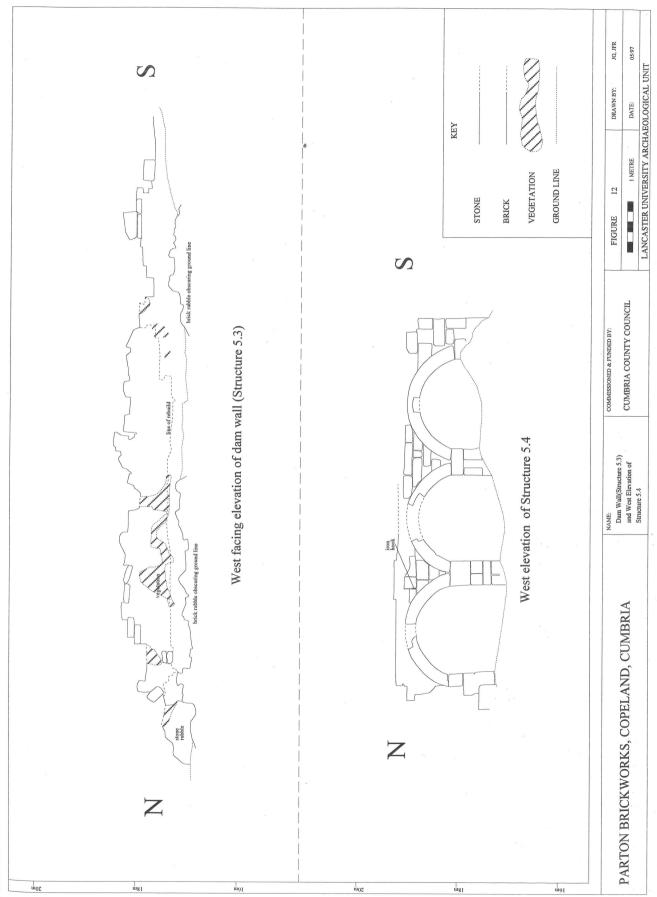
West elevation of Structure 5.4 and west elevation of dam wal (Structure 5.3)
